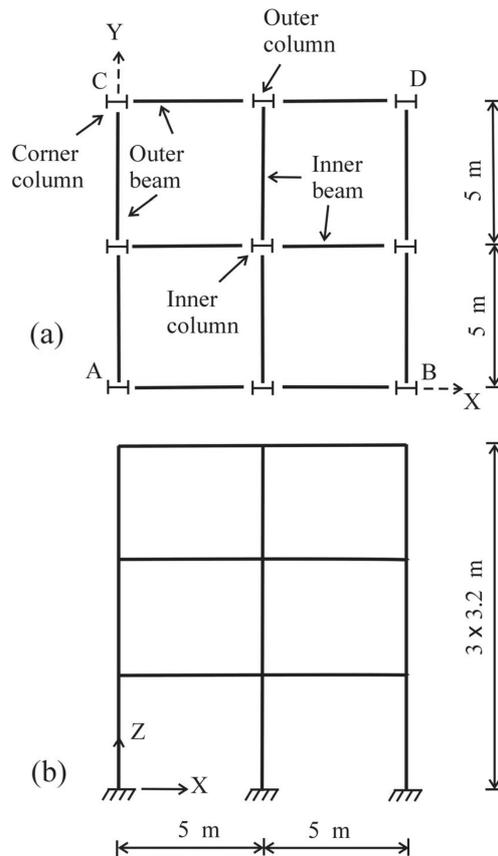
Three-storey 63-member space frame: (a) plan, (b) side view
